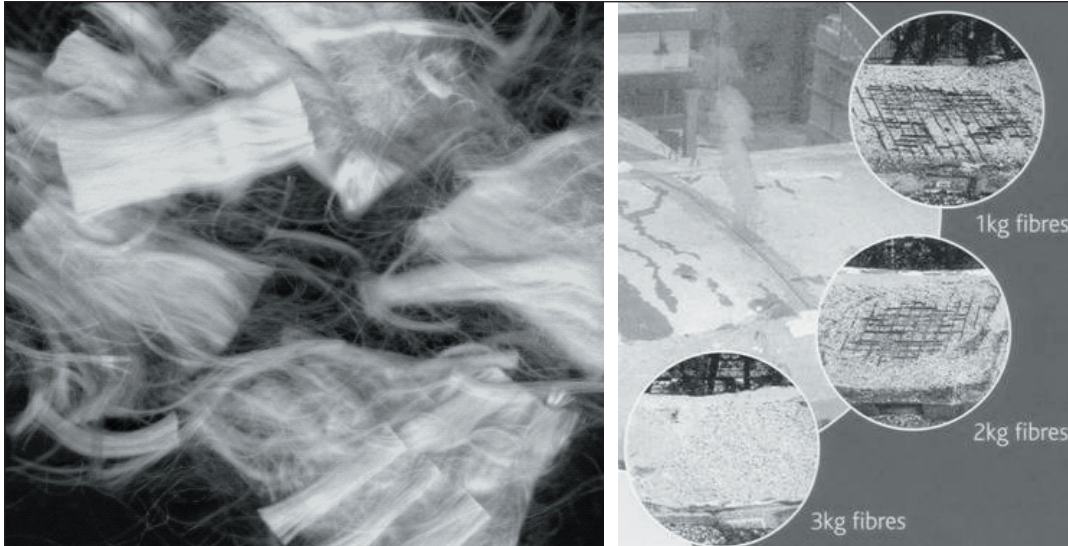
Monofilament polypropylene fibres and degree of surface spalling with increasing dose of fibres per cubic metre of concrete (Courtesy ADFIL UK Ltd)
